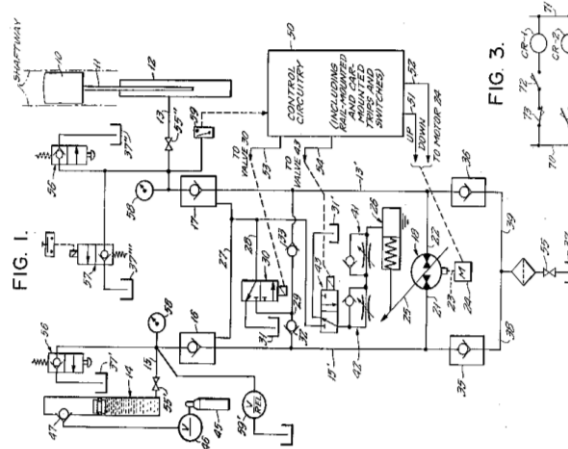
Hydraulic and electric-control circuits of Hydraulic elevator mechanism [17].
